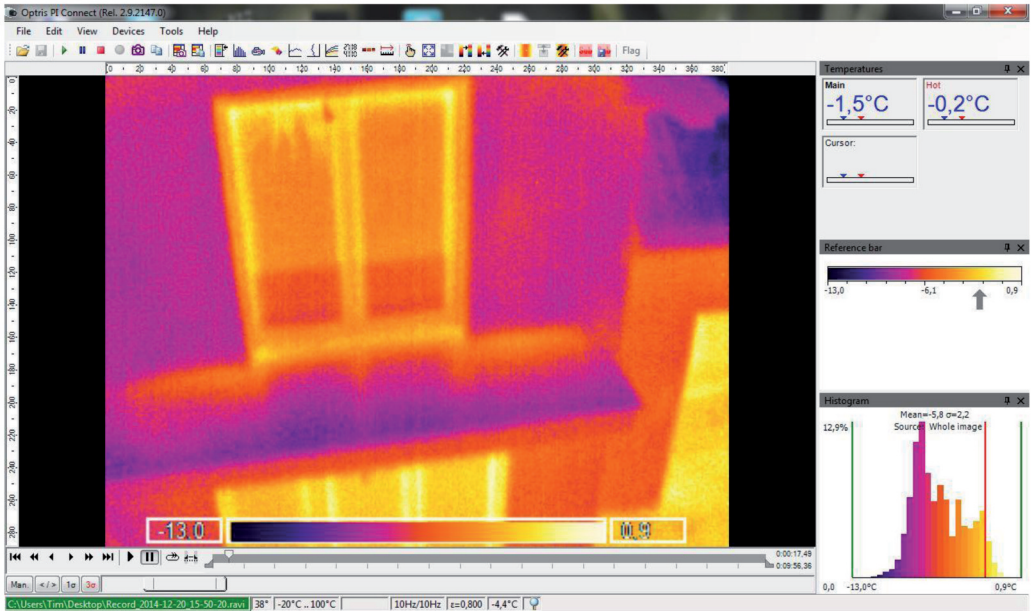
Picture of the facade from the west. Level +1. Visible thermal bridge on the connection of the balcony slab with the building construction [zdj. T. Sasin, 2014]
